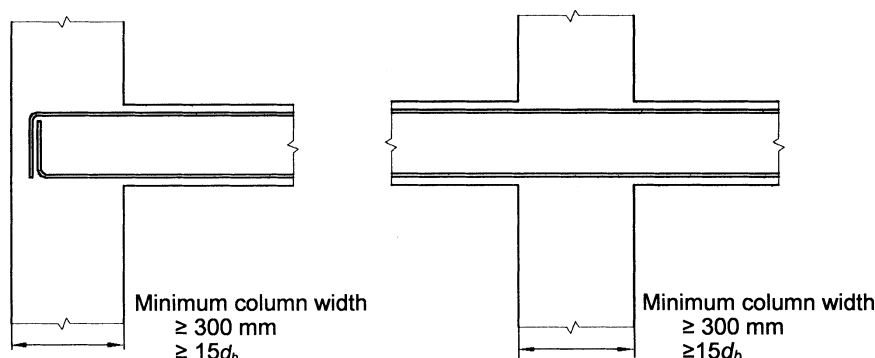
MINIMUM SIZE OF RC COLUMNS BASED ON DIAMETER OF LARGEST LONGITUDINAL REINFORCEMENT BAR IN BEAMS FRAMING INTO IT
